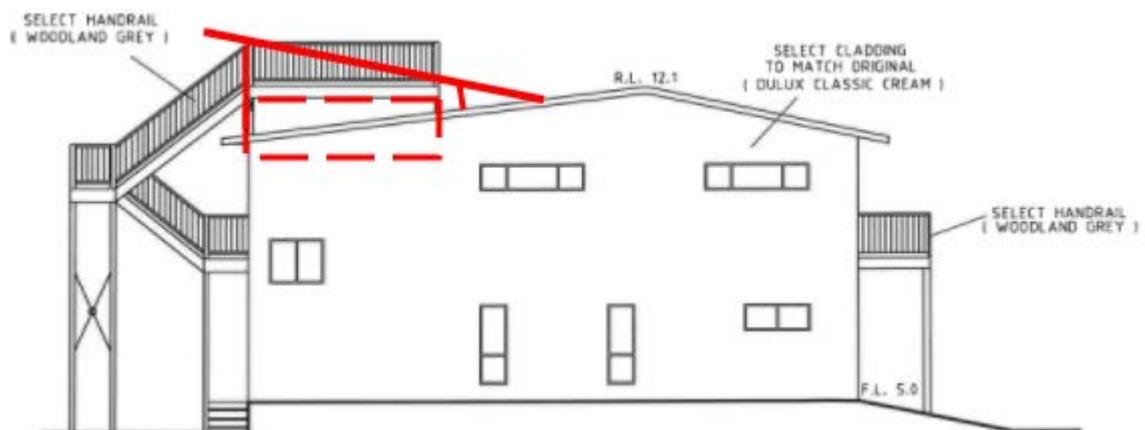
Possible example of integrating the deck into the overall building (stairs should also be less visually dominate and integrated to the building form)
